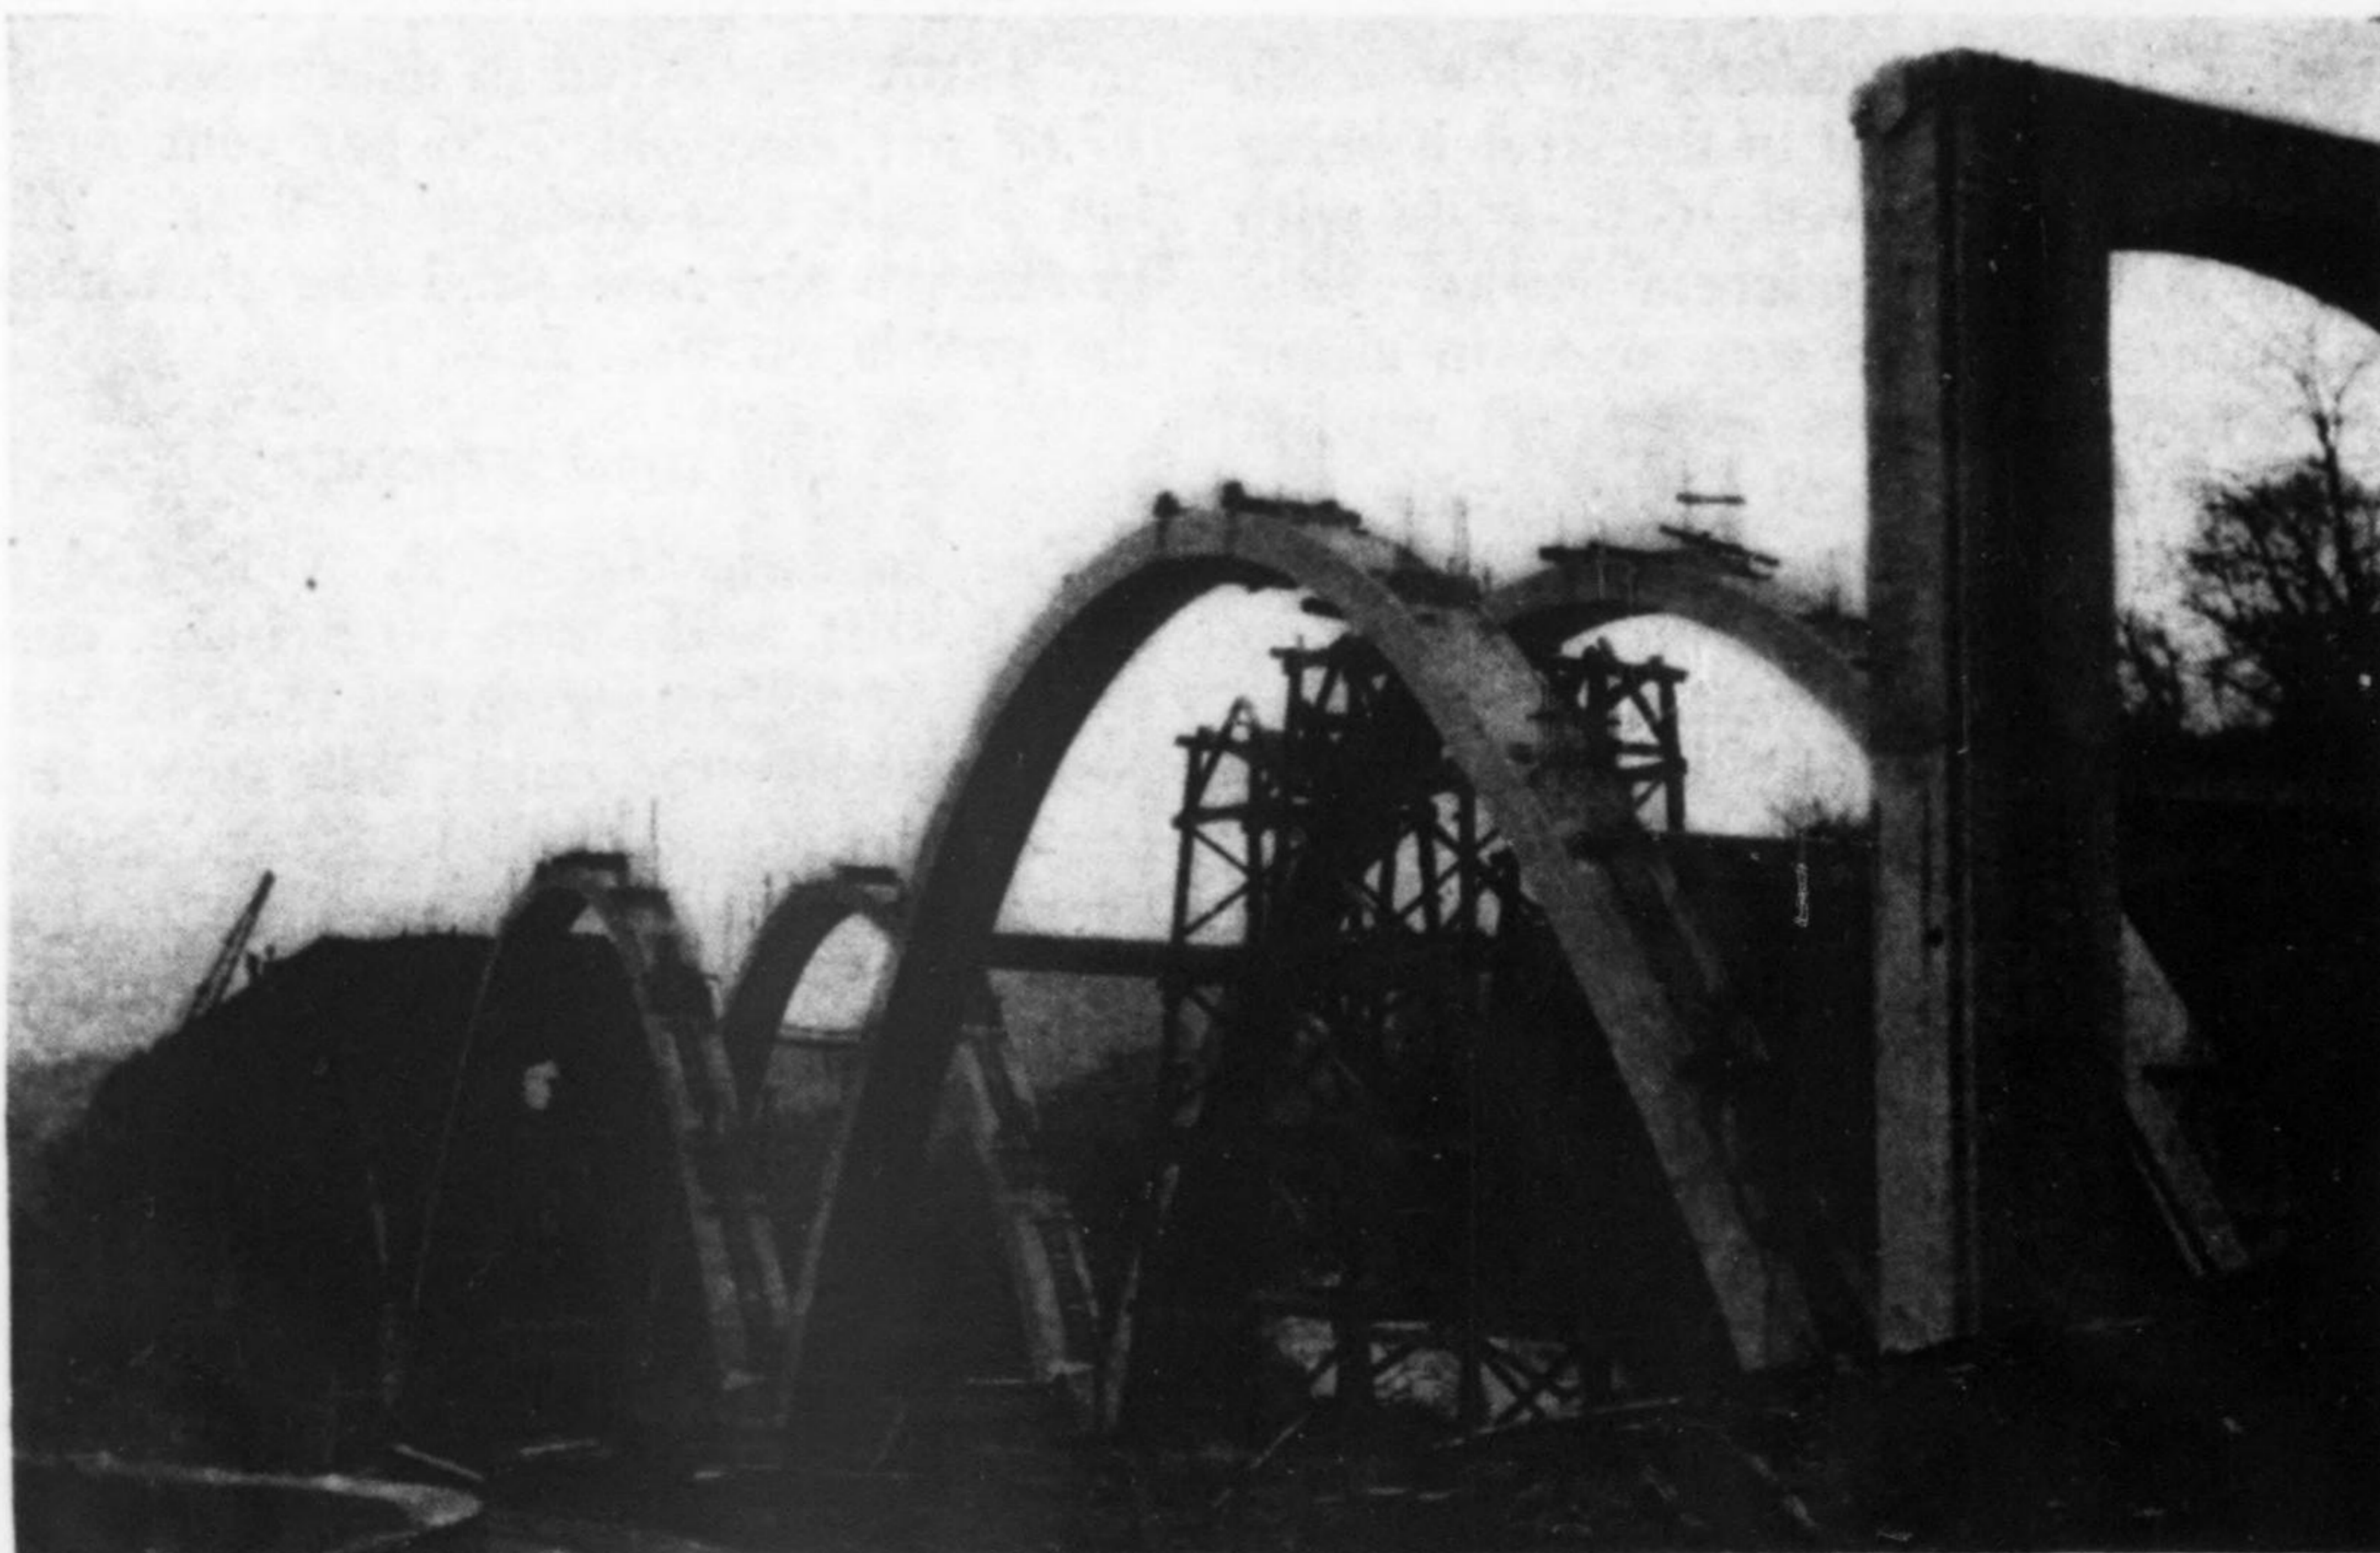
COMPLETED ARCH RIBS of new concrete viaduct with deck construction in progress at one end.
